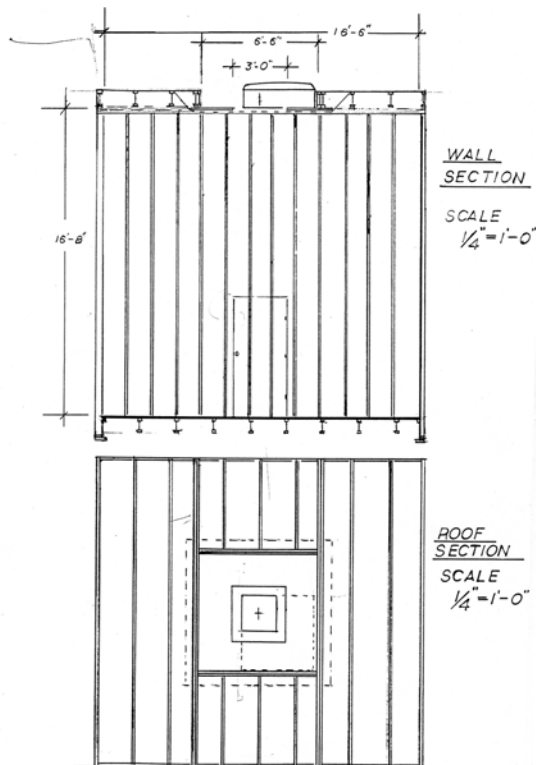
Photometric test chamber elevation and plan (reduced scale)
